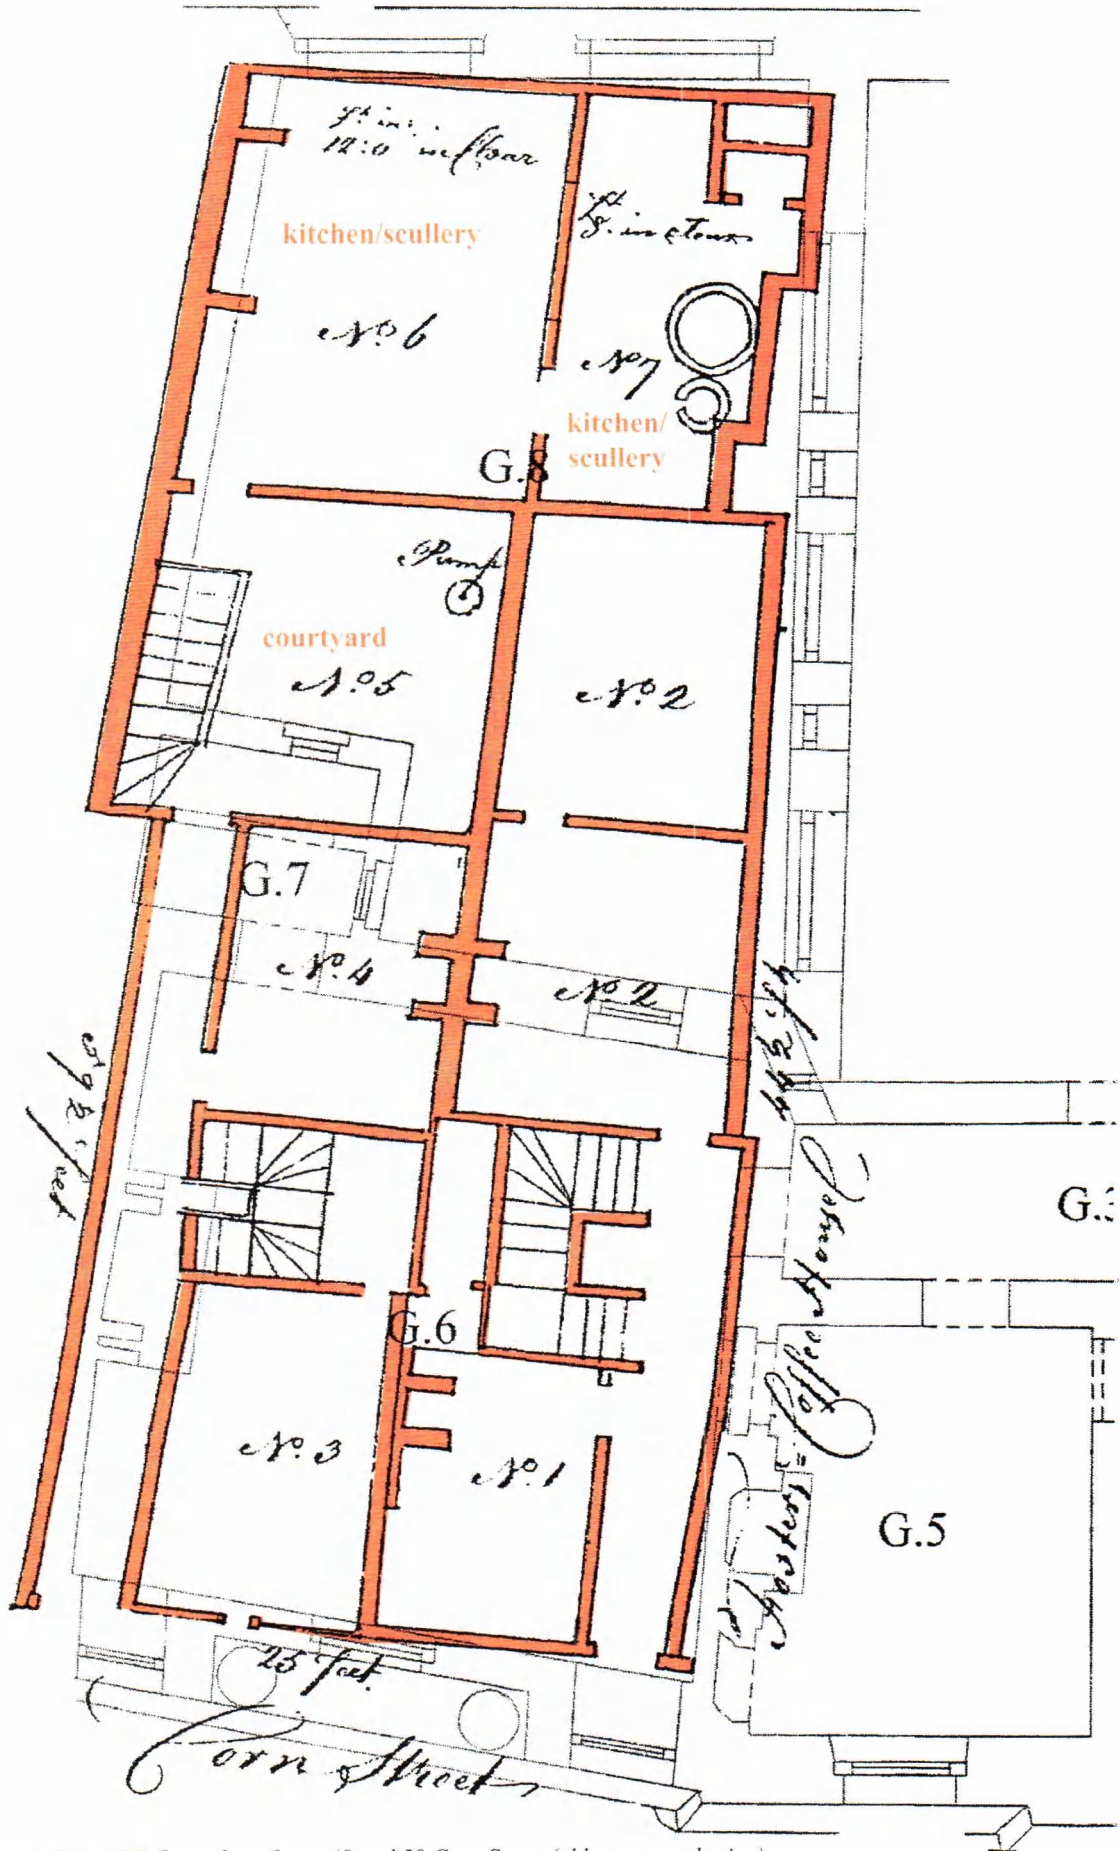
Layout of the 1675 floor plan of nos. 49 and 50 Corn Street (old street numbering) overlaid on a modern building plan (after Leech 2000).
